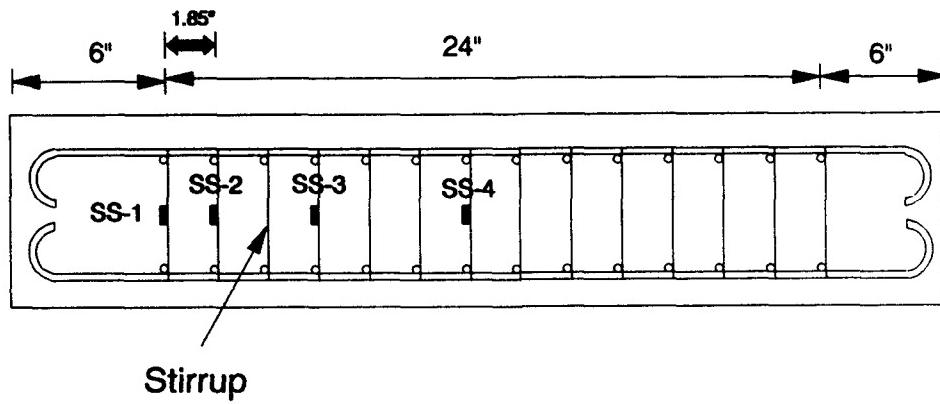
Strain Gage Locations on Stirrups in Slab Nos. 11 and 12
